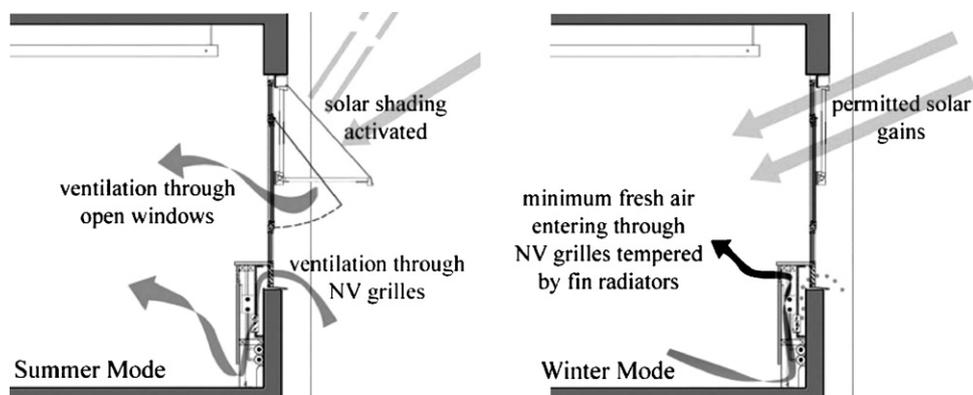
Typical window section in the surveyed building showing ventilation strategy.
